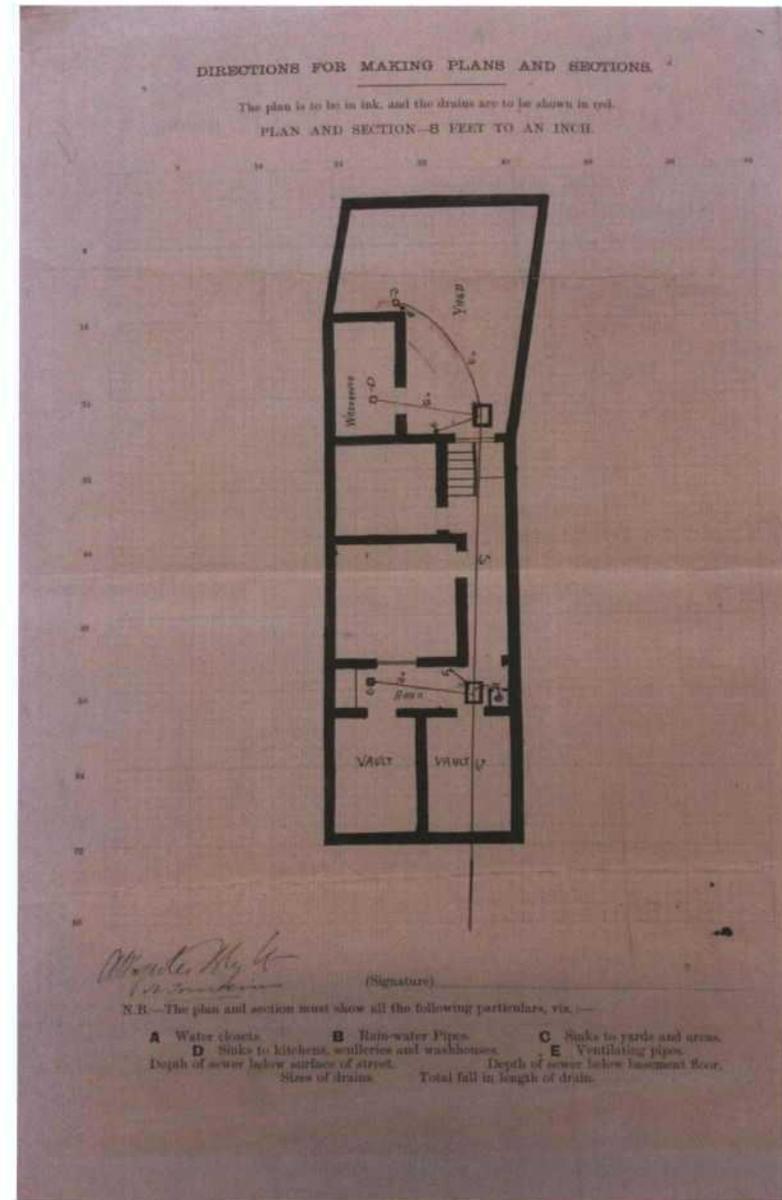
1893 Plan of Basement showing a washhouse at the rear of the building but unconnected to the rear room, Westminster City Archives
